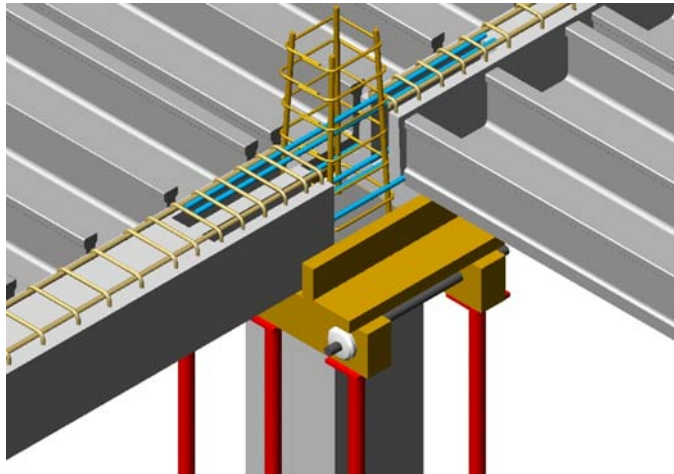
Column support for prestressed beams with rigid connections (PREFACINCA)
